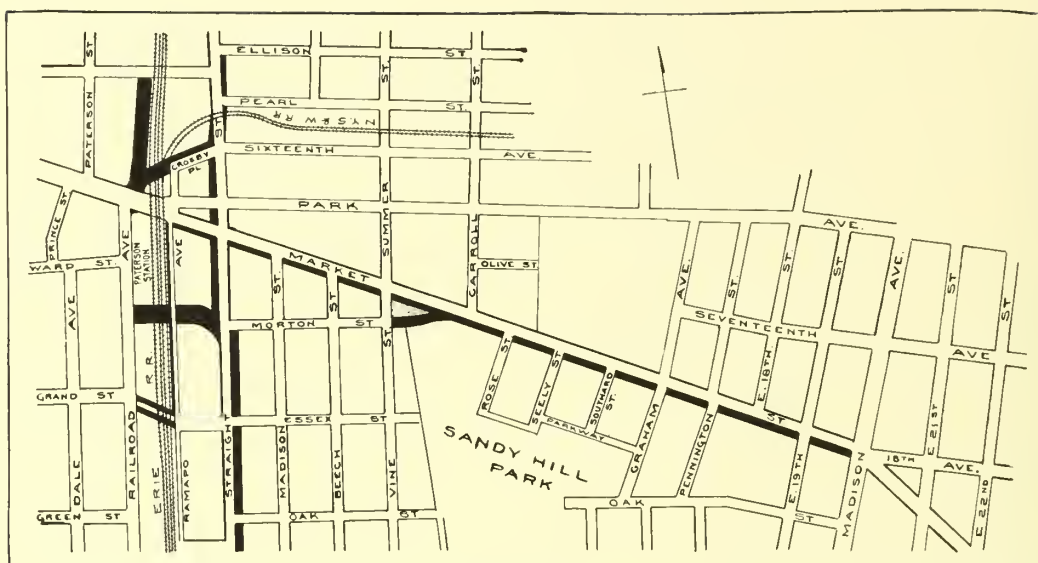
Market Street widening. Railroad Avenue extension. Crosby Place and Sixteenth Avenue extension. Morton Street extension.
